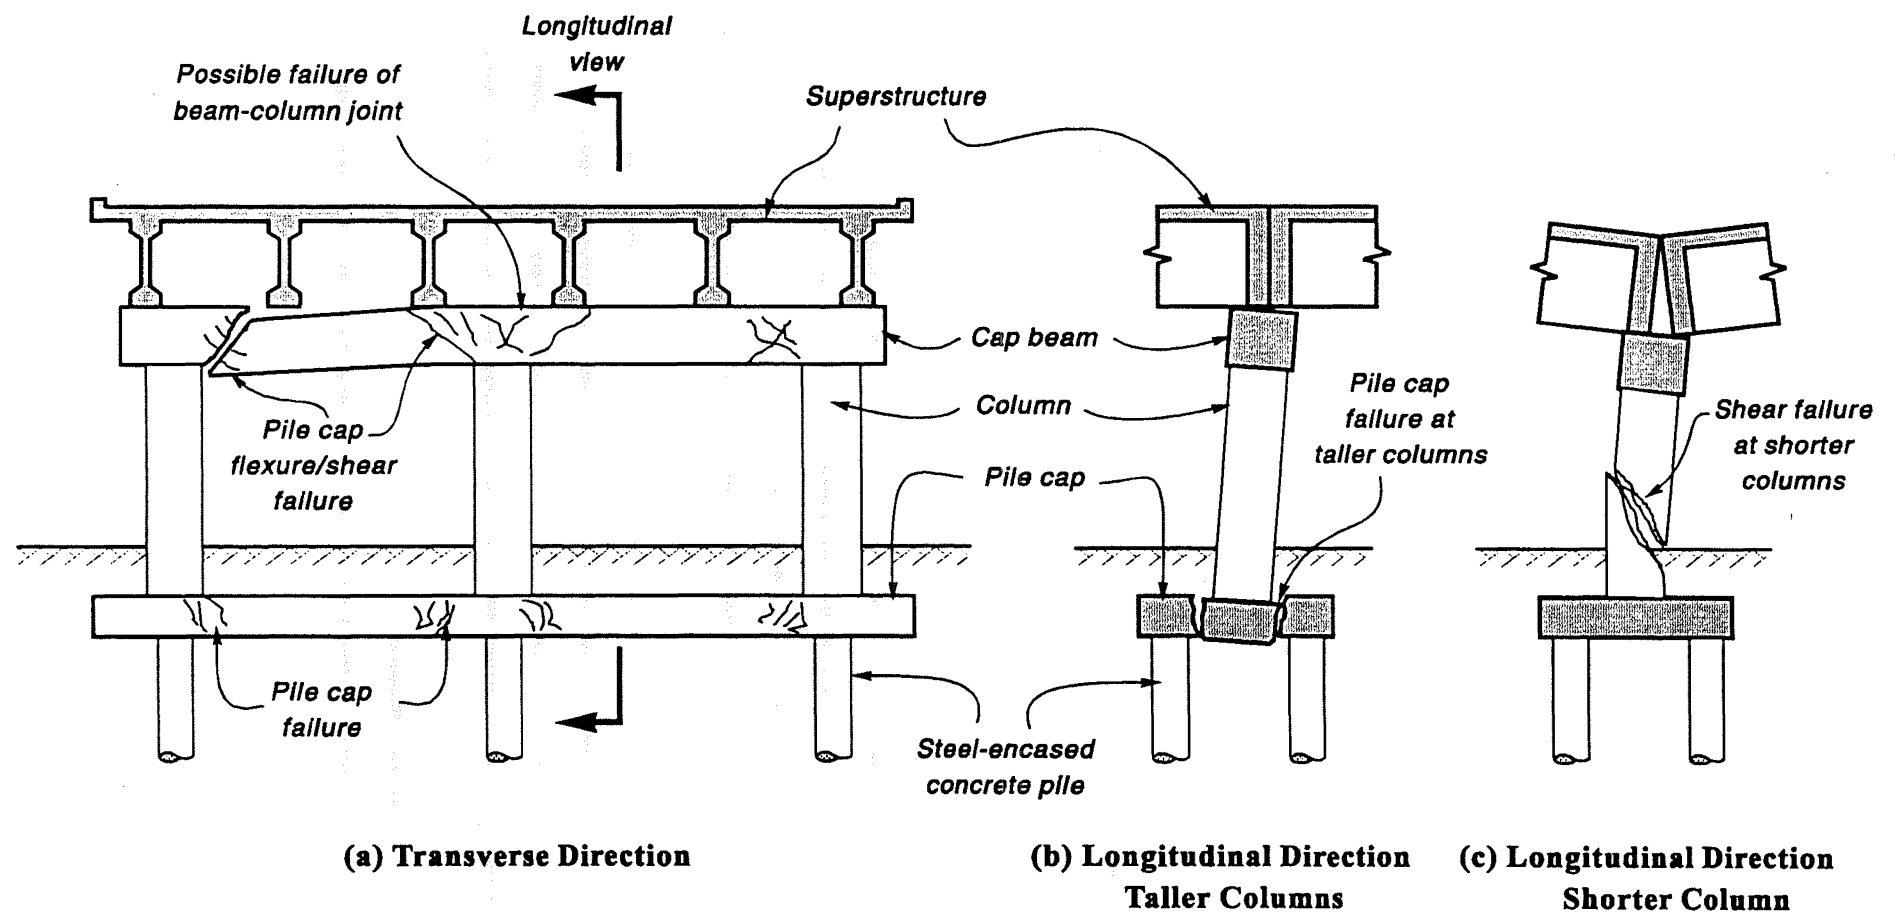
Expected earthquake failure mechanisms for typical multi-column piers of the Thorndon bridge, before retrofitting.
